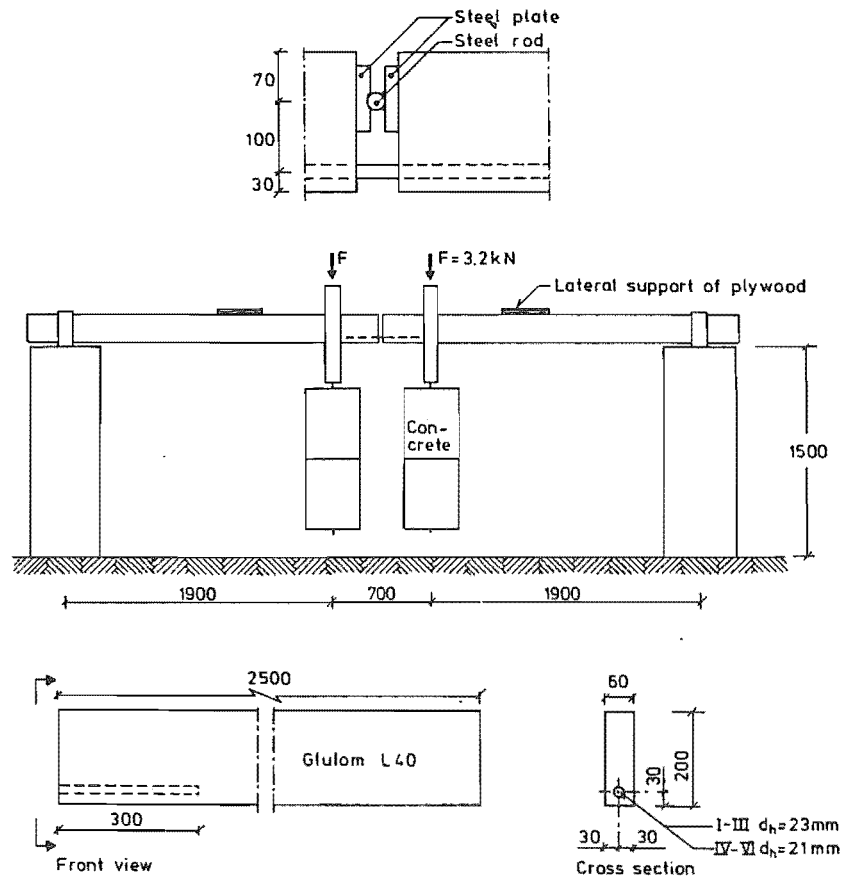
Sketch of outdoor specimens for long duration axial loading test (Riberholt, 1986)
